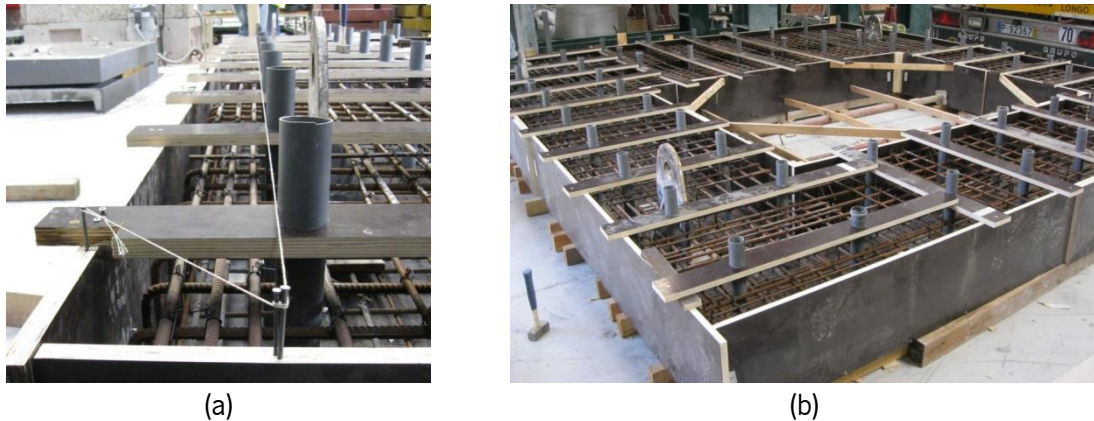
Foundation construction: (a) vertical tubes positioning and (b) box-like formwork and suspension pieces already installed
